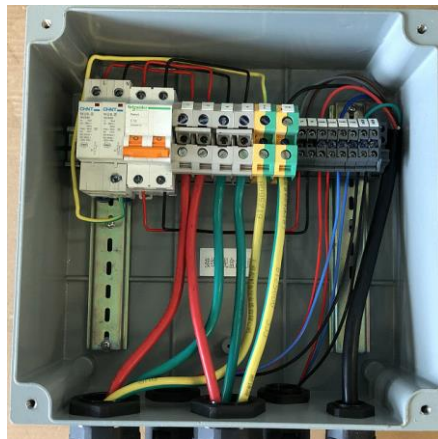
Cable Wiring Method inside the Unit Wiring Box
